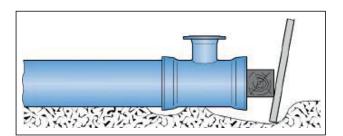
Use of assembly equipment specific to nominal diameter
